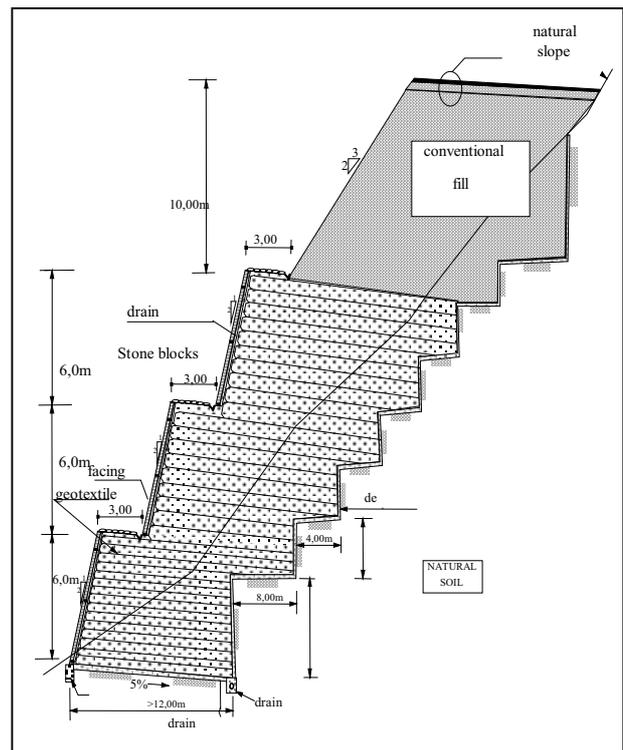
Typical section between stations 20+15.00 and 24+15.00
